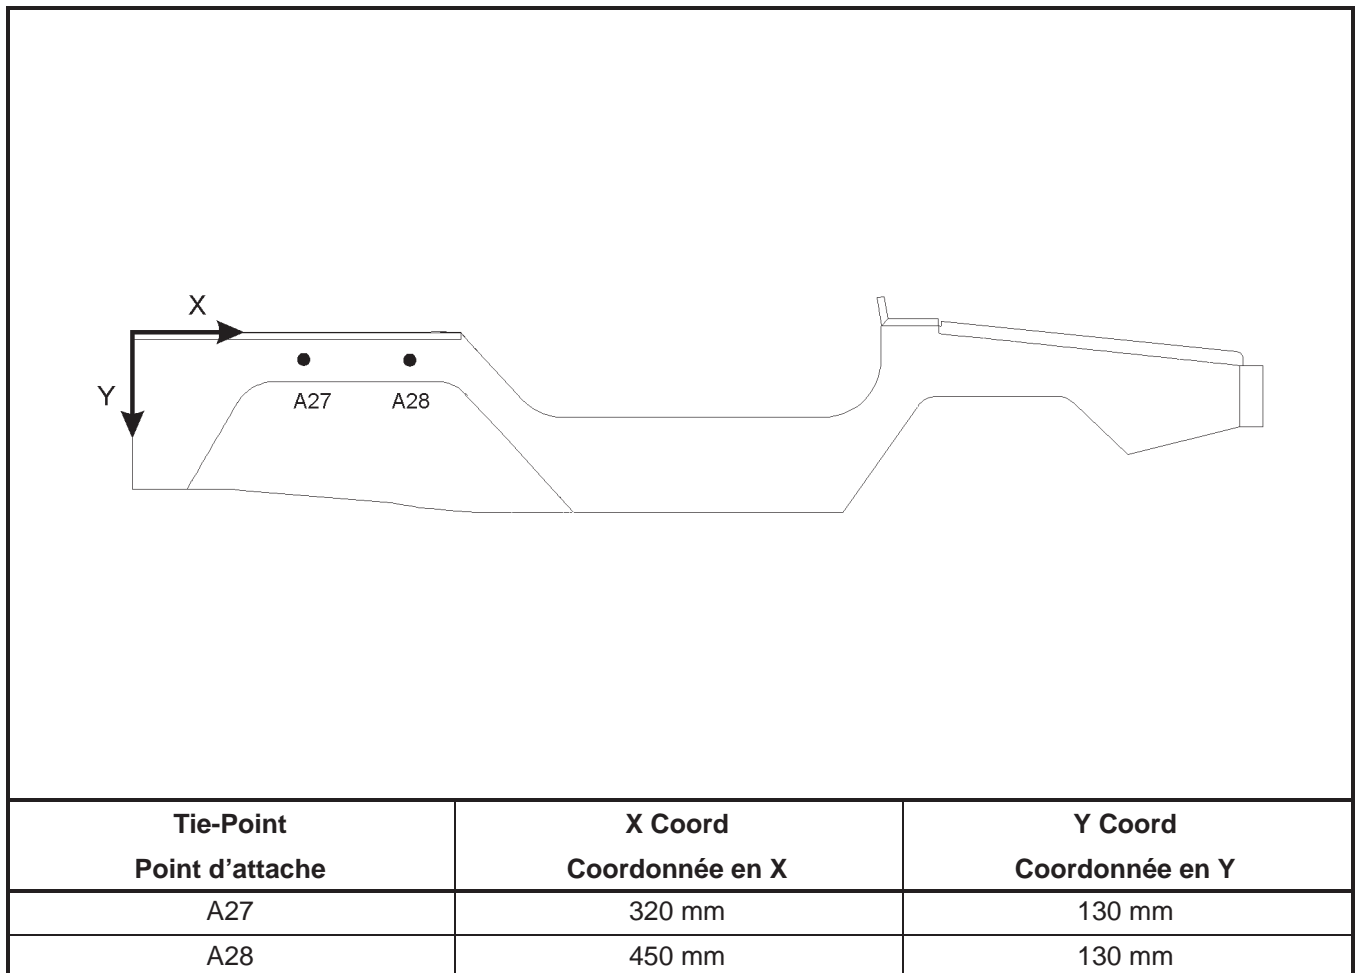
Installation of Cable Tie-Points on Roadside Wall – AC97
